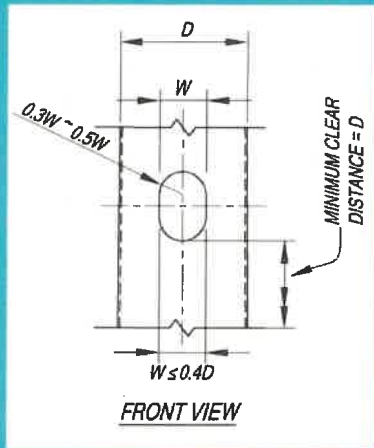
Details of Unreinforced Holes and Cutouts
